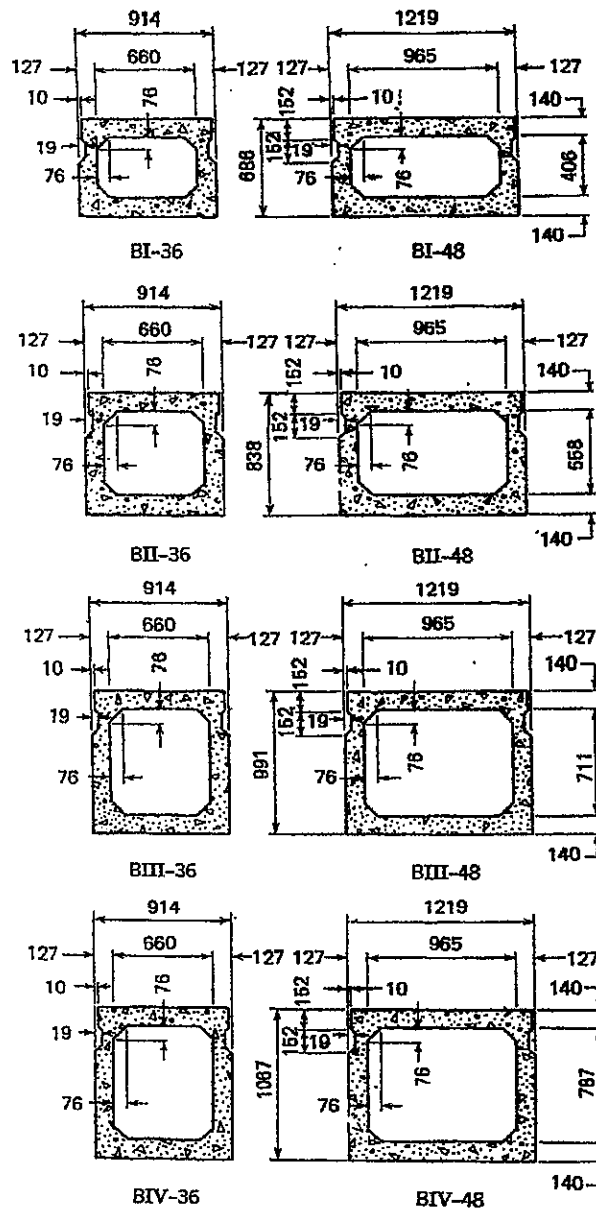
(e). Standard AASHTO-PCI prestressed concrete box beams for highway bridges.
